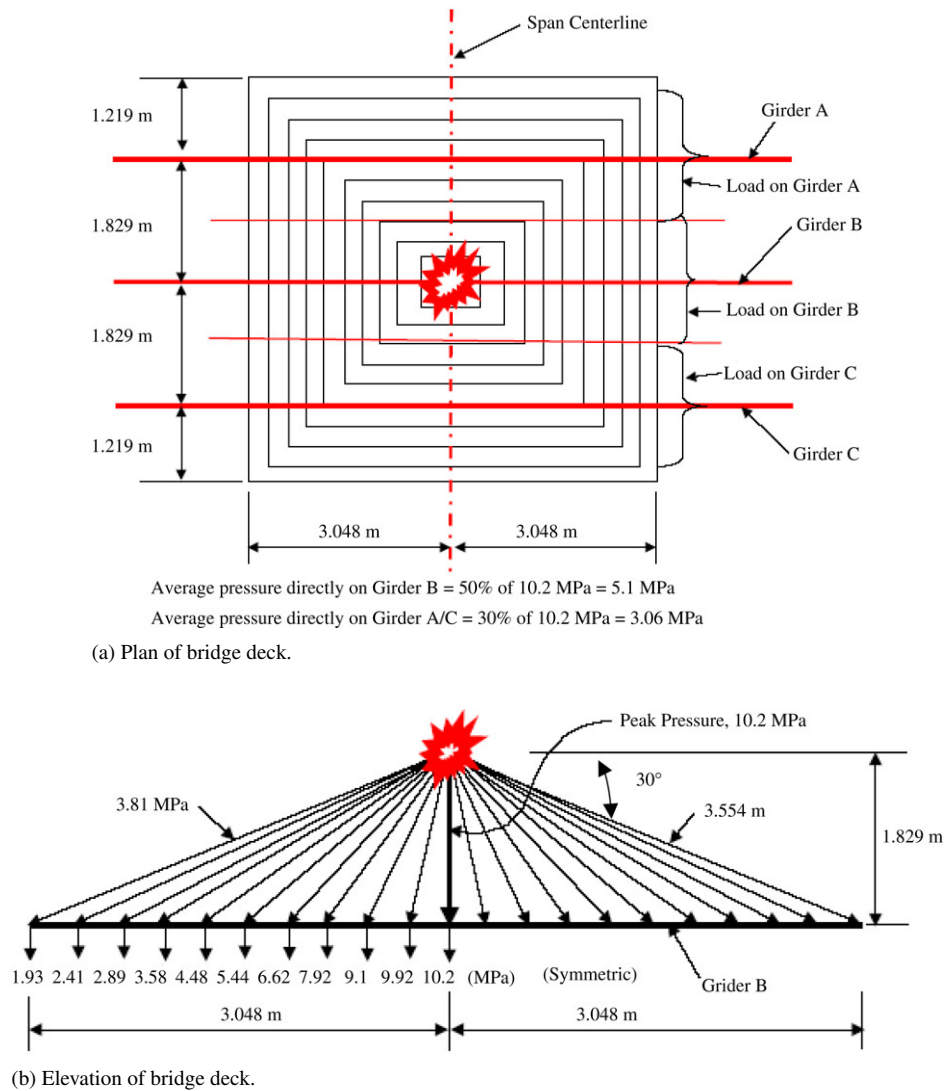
Plan and elevation of blast pressure distribution on bridge deck.
